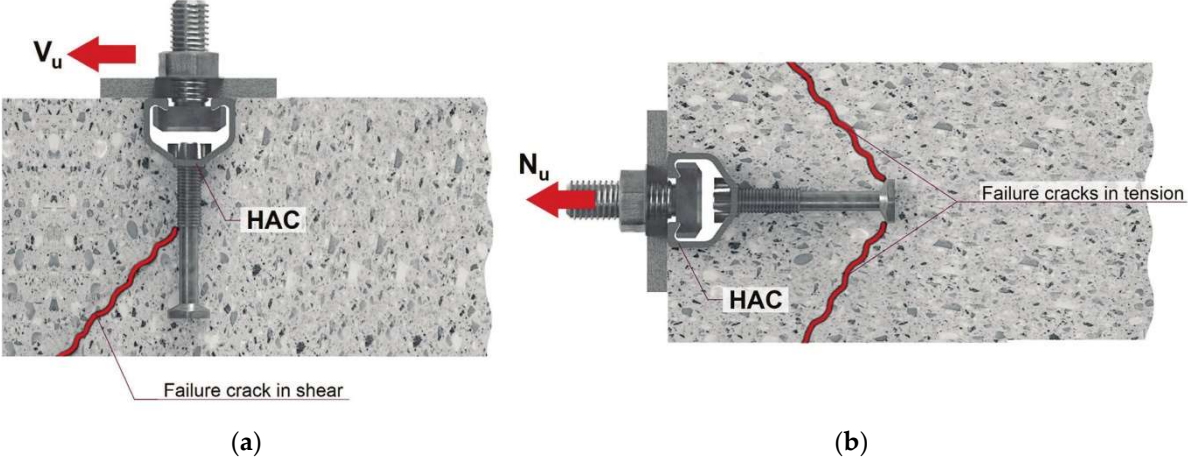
Installation of anchor channels in curtain wall applications [3]: (a) ToS; (b) FoS
